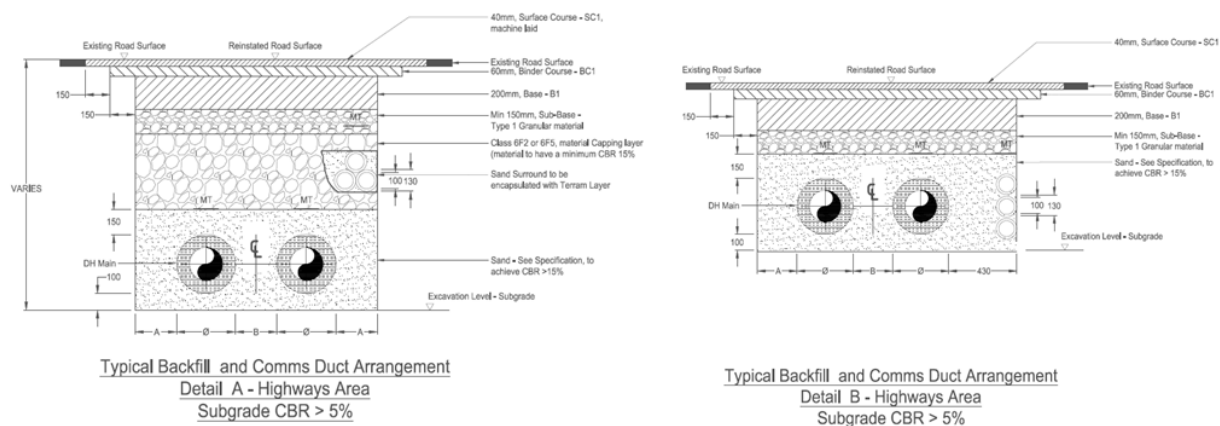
Typical Trench Details for Pre-Insulated District Heating Pipes.
